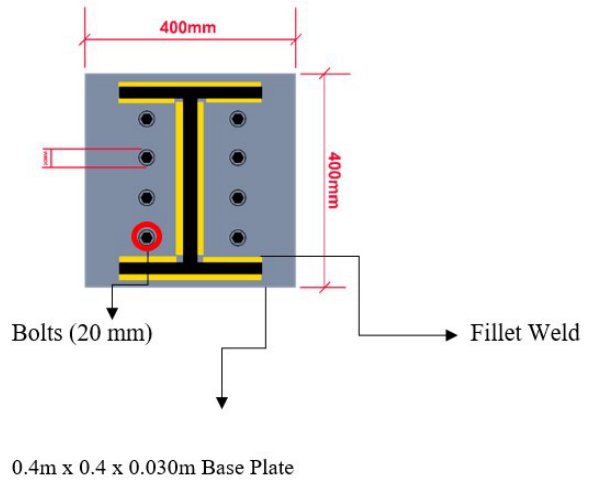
Column and Pedestal weld and bolts connection
